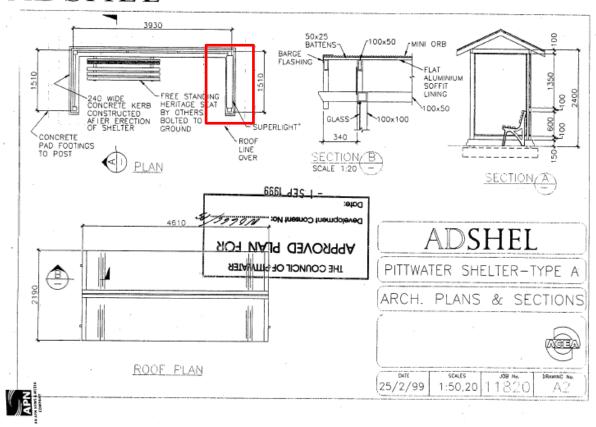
Shelter C1 DA0666/99 Stamped Elevations 2 of 2
